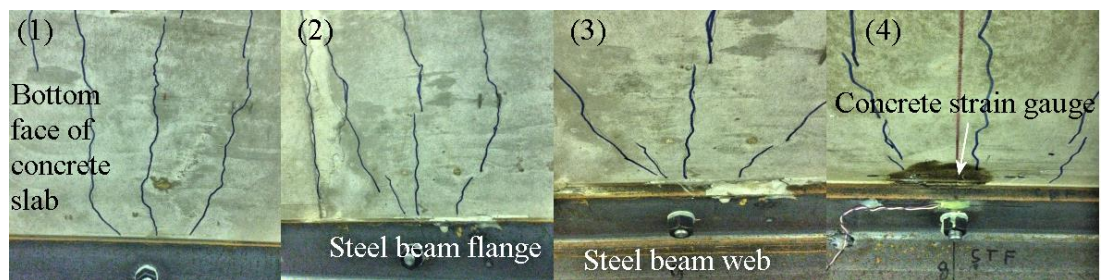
Crack pattern in several bottom faces of slab during beam test
